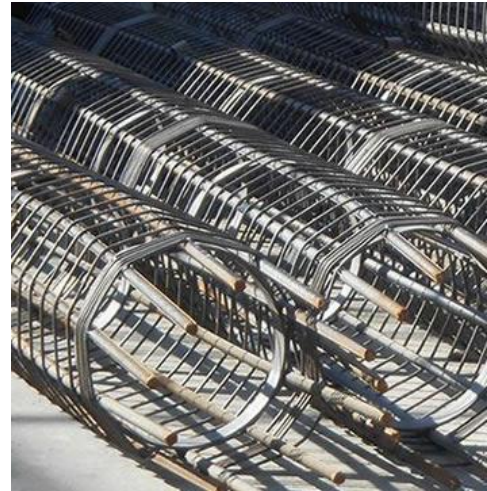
Column Reinforcement for bridge (Ref. www.trenchmesh.com)
